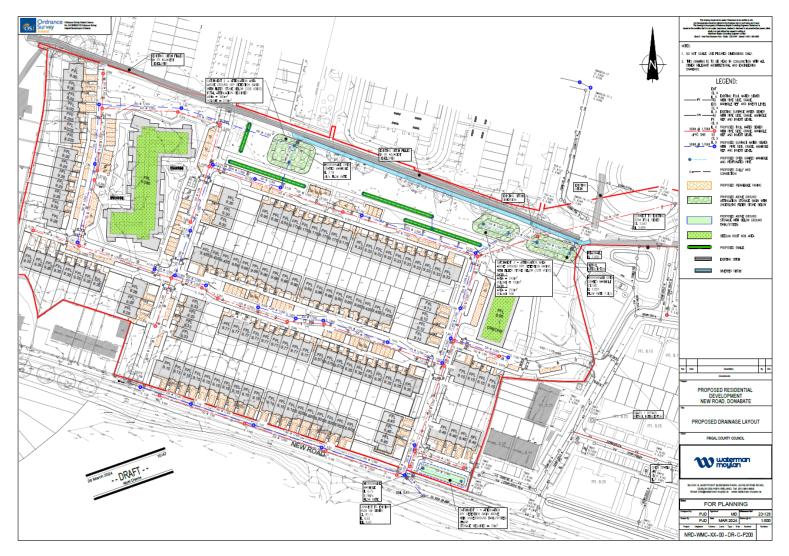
PROPOSED DRAINAGE LAYOUT. DRAWING NO. NRD-WMC-XX-00-DR-C-P200 (WATERMAN MOYLAN, 2024).
